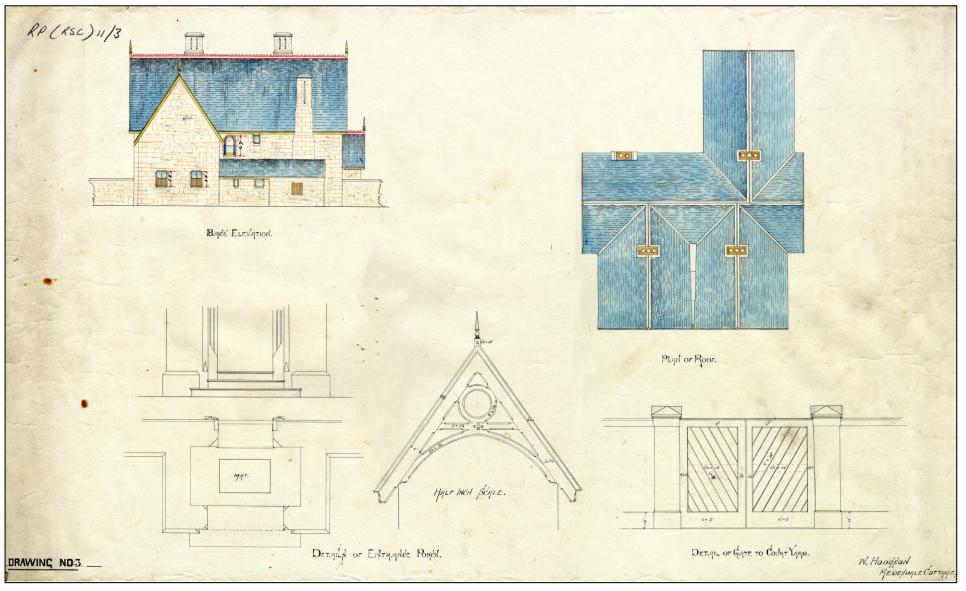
Elevation and plans relating to the construction of a parsonage at Horsley, 1880's (ROC_M&D 028)
